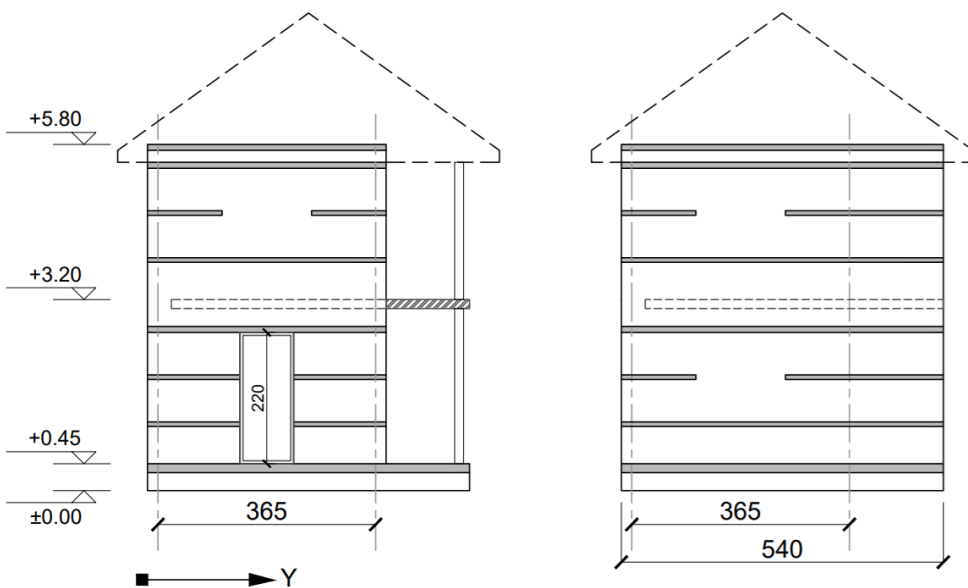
House elevations along Y axis: Interior wall (left); Exterior wall (right)
